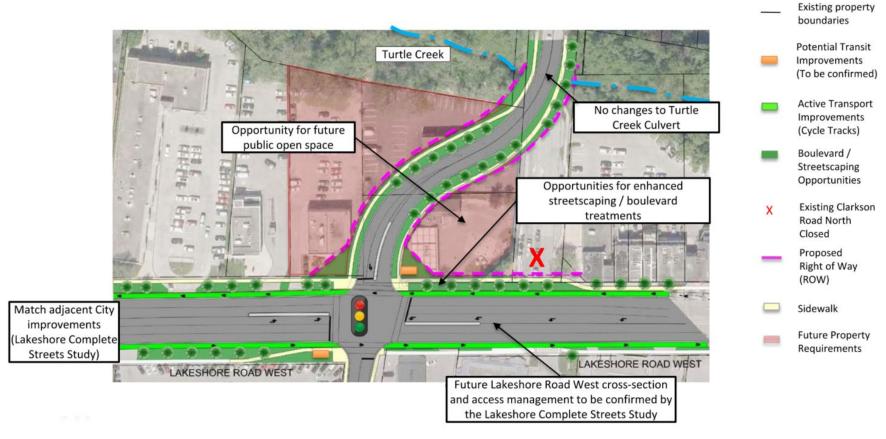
Recommended Plan - Preferred Solution - Overview
